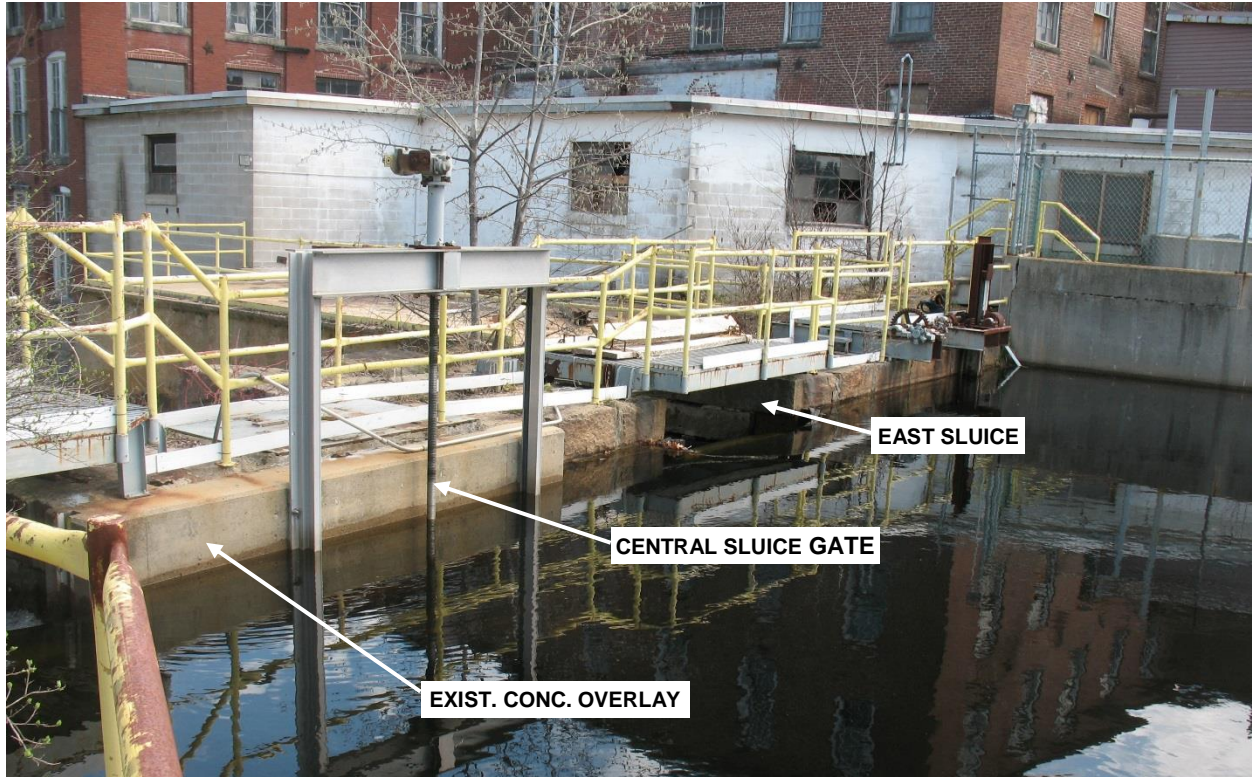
Upstream View of Dam from West Abutment, 5/2/2018
